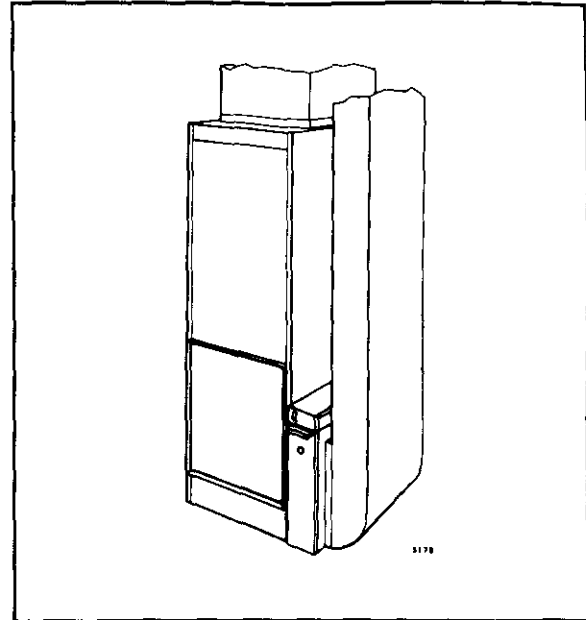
HIGHBOY FURNACE. SIDE INSTALLATION. AIR CLEANER IS MOUNTED VERTICALLY WHERE RETURN ENTERS SIDE INLET OF FURNACE.
